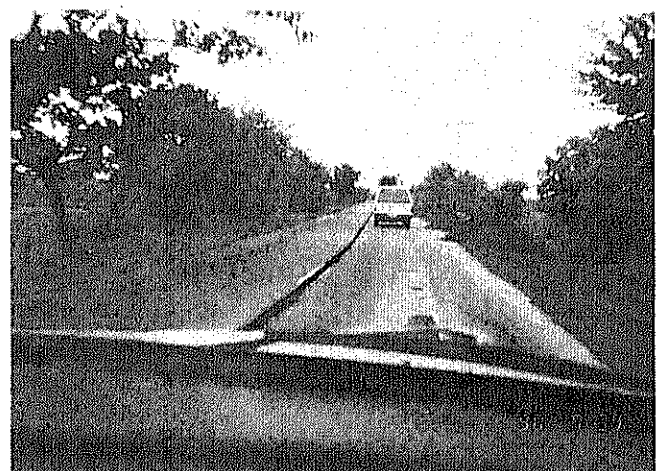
Cracks along center line near 135km (?) spot on No. 3 Line
